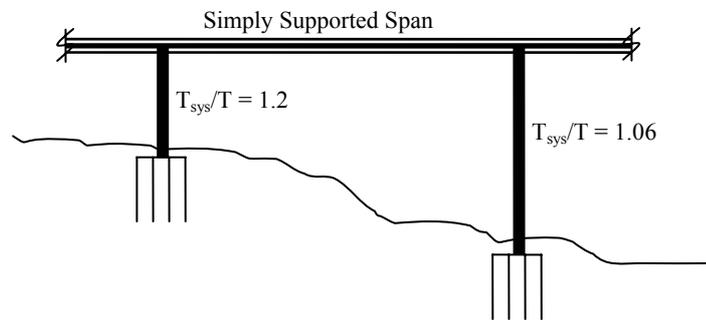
An example bridge with simply supported spans and pile-supported piers on soft soil
